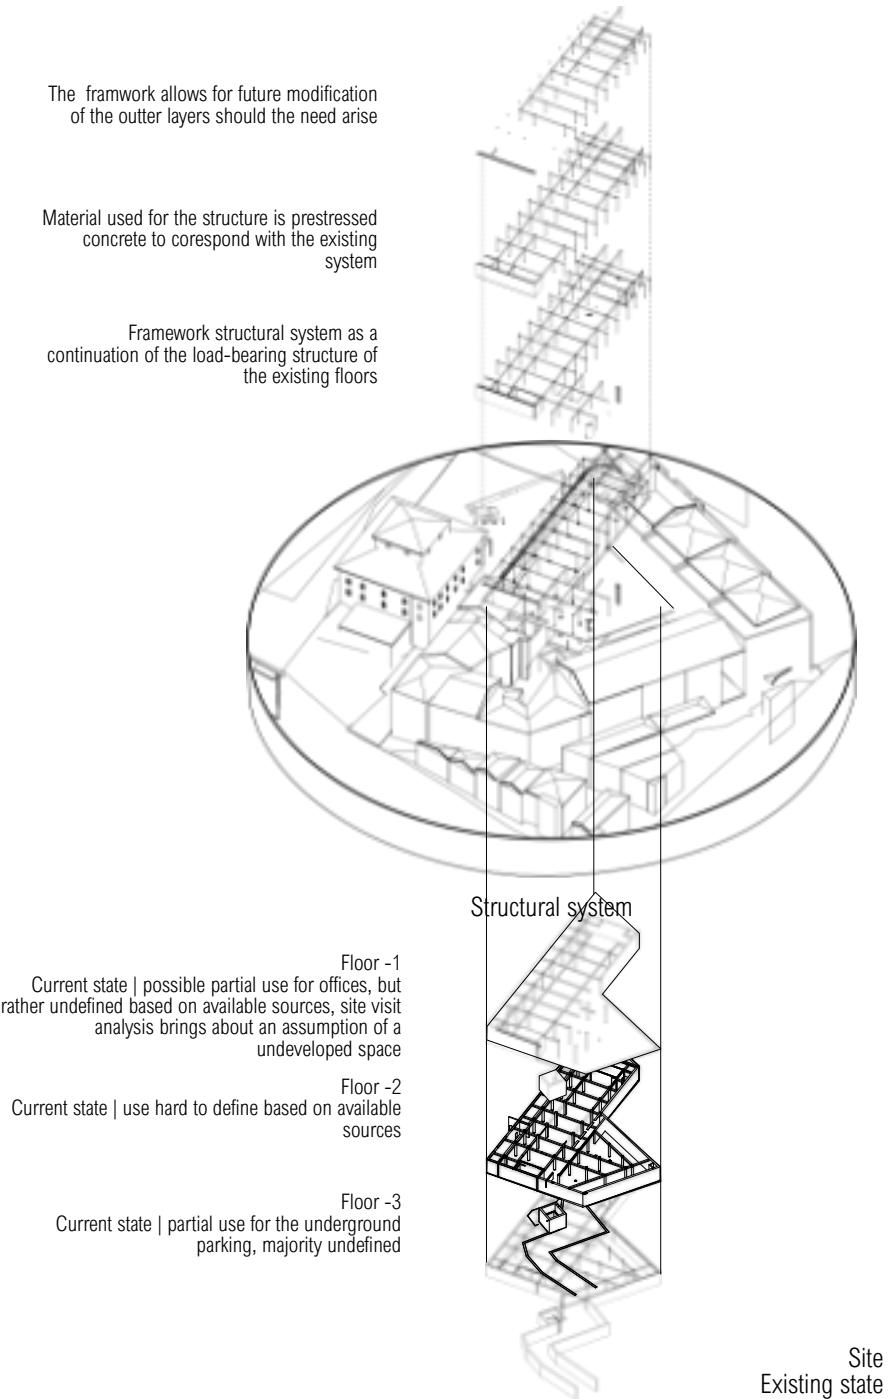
The rigid frame structural system of the site, continuing the structural system of the existing underground storeys, own work
